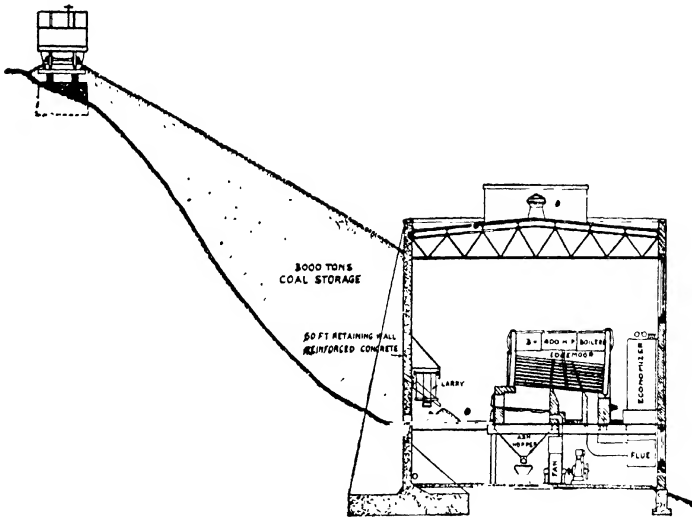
BOILER-HOUSE INSTALLATION OF THE NEW YORK AND PENNSYLVANIA FAIR CO., WHITSTORD, N.Y.
